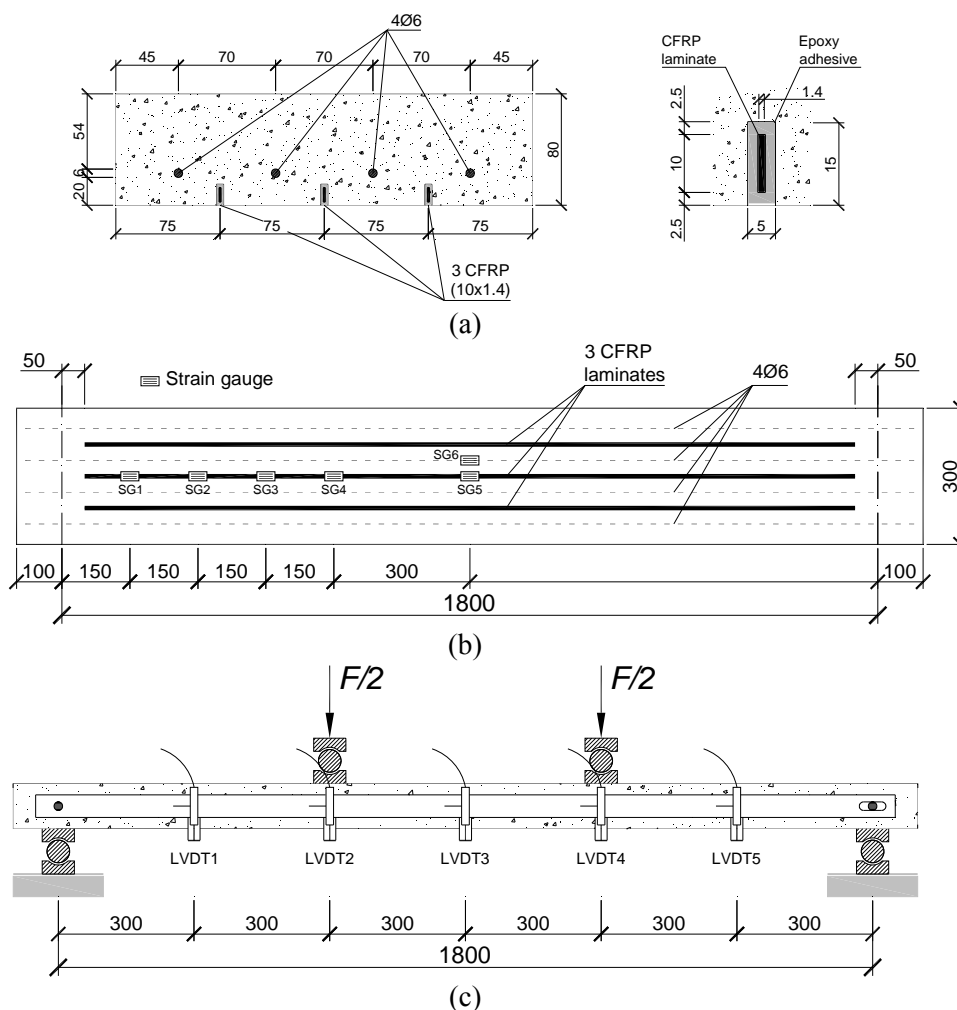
Slab specimens: (a) Cross-section geometry and reinforcement detailing; (b) Longitudinal geometry, reinforcement detailing and gauge instrumentation; (c) Test configuration. Note: all units in [mm].
